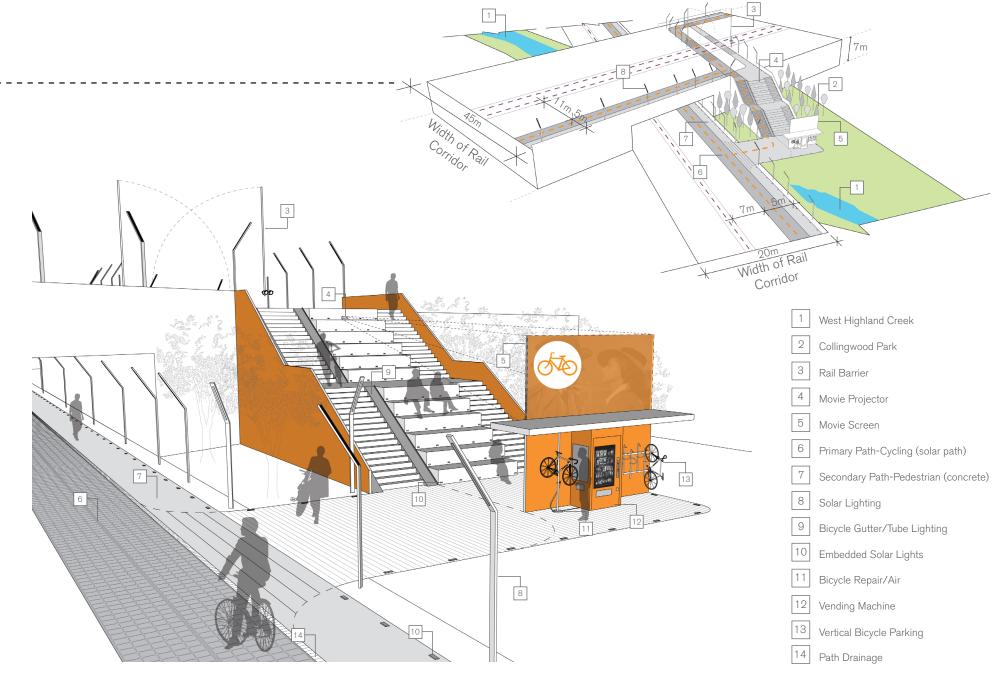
A series of stairs with bicycle gutters connect the rail corridors while providing a view of Collingwood Park, a place to rest, and watch an outdoor movie. Rail barriers allow the existing raised rail corridor and proposed mobility paths to safely negotiate by one another.
